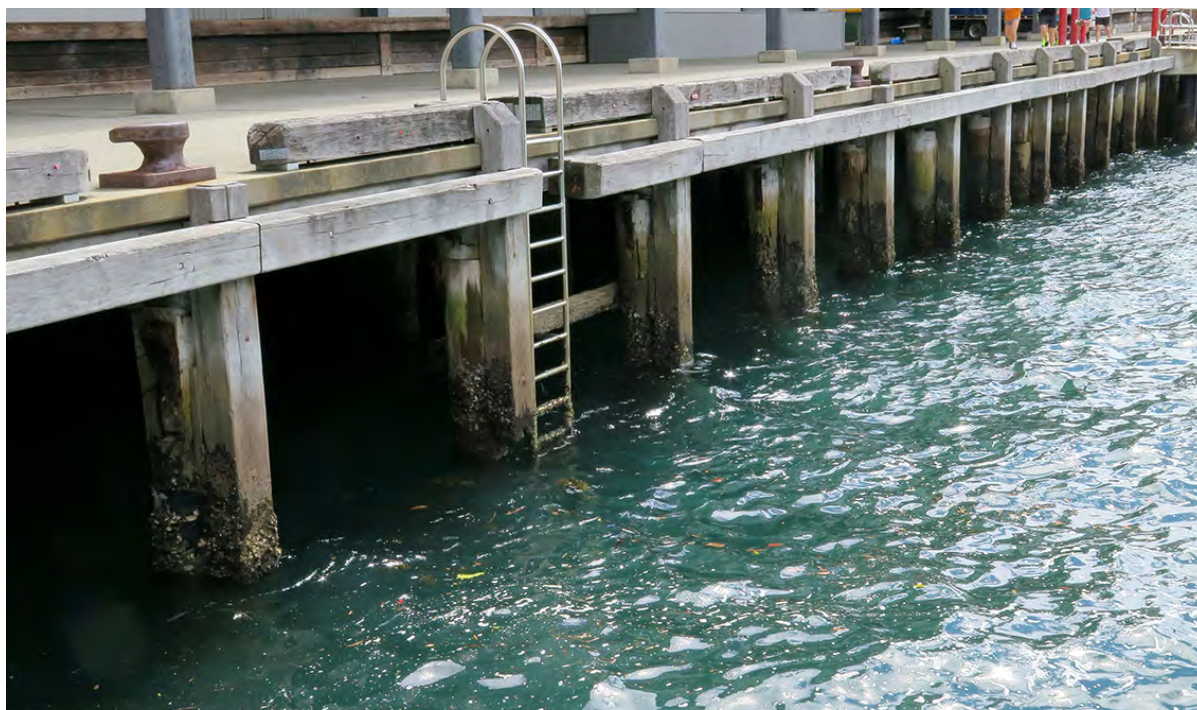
Photograph of timber piers of Pier 2/3. (Source: CRM 2016)
